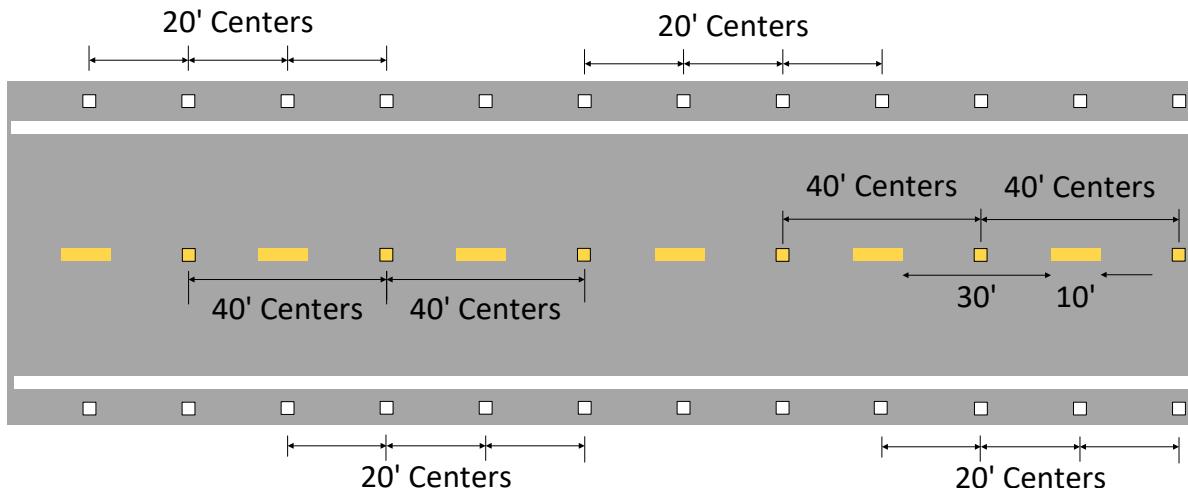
Proposed Enhanced Pavement Markings for FM 1179.
